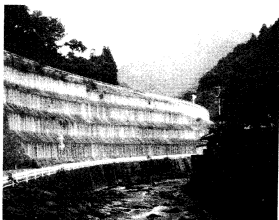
4-Berm reversed Y type stretch-made polymer grid (SR) reinforced retaining wall (the foremost one in 1984)
